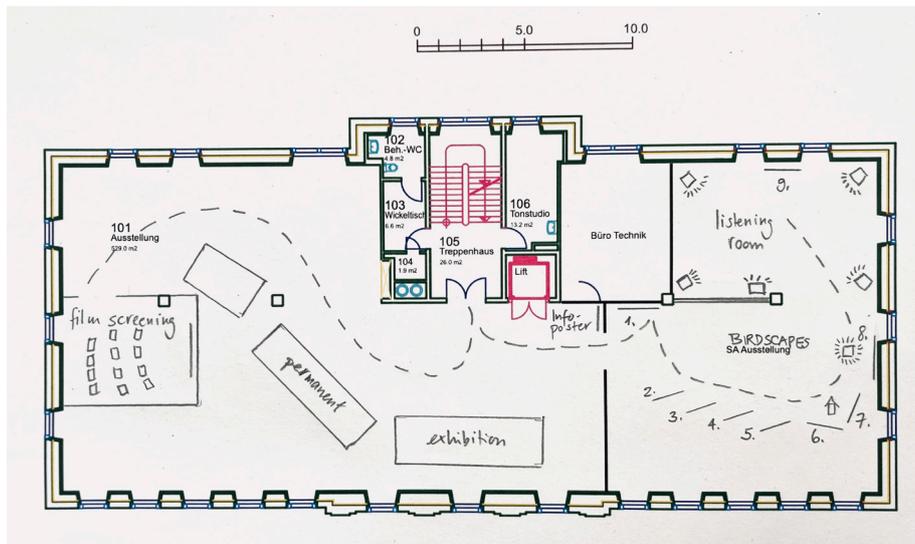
Floor plan: temporary exhibition room of 100 square metres (right) and film screening room (left).
